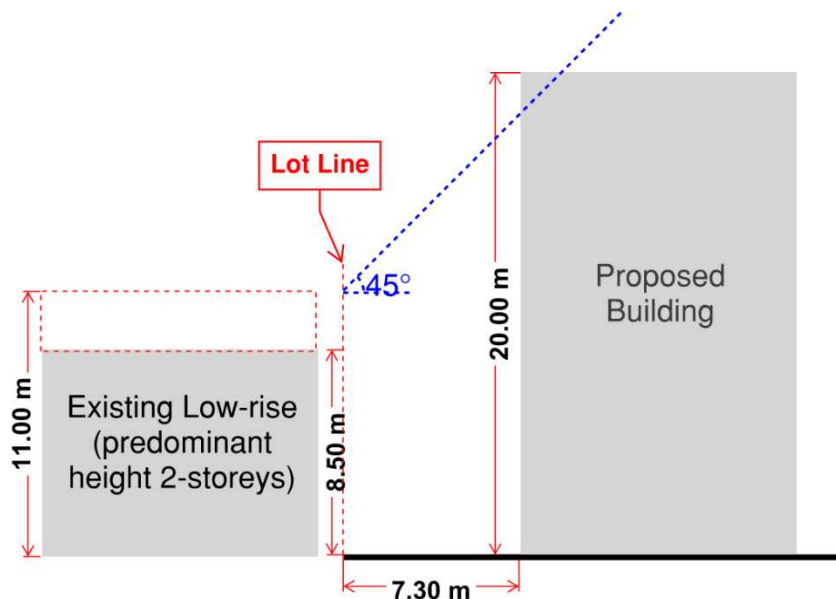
Site Plan Excerpt (Building 2) and Angular Plane detail (North)
